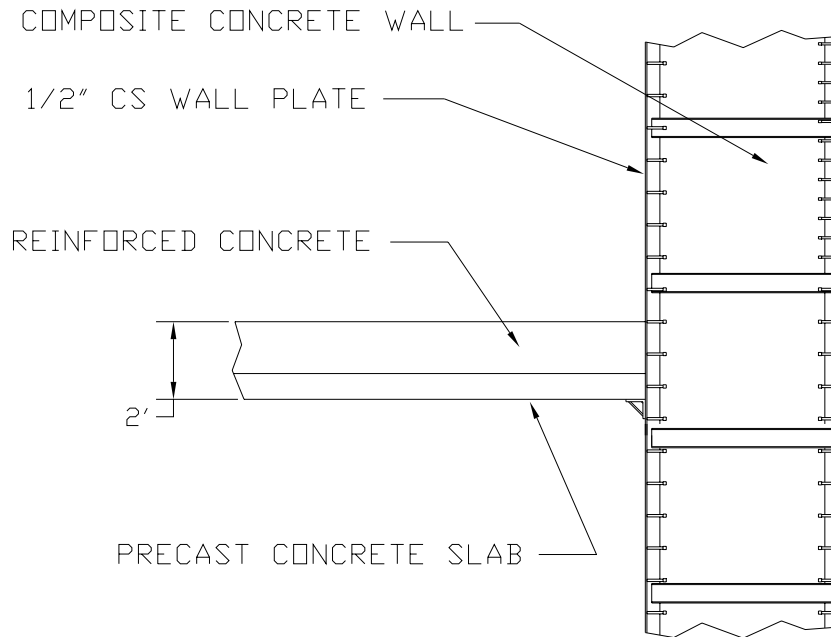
New Fuel Pit Floor and Wall Detail
